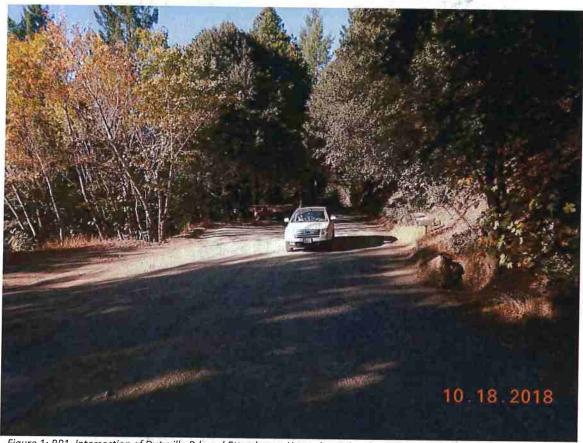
RP1. Intersection of Dutyville Rd. and Ettersbuerg-Honeydew Rd. 25'+ road width. No sight distance restriction.
